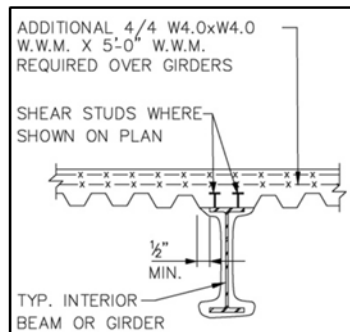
Typical Floor Construction, Metal Deck Parallel to Beams or Girders
